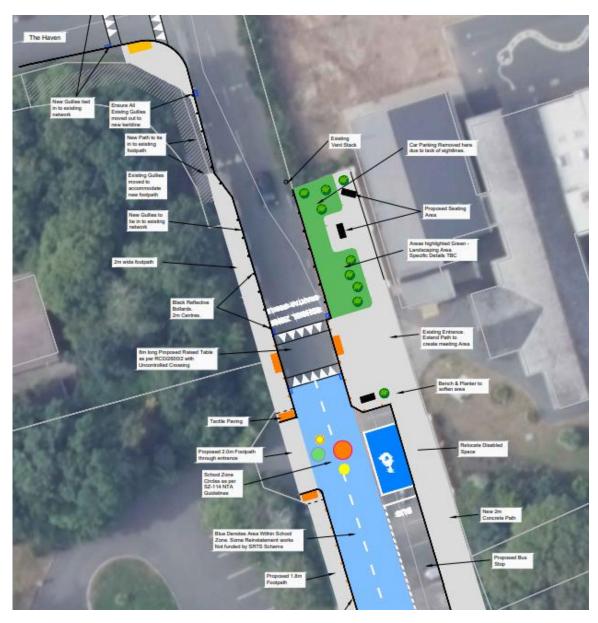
Example of design drawing for Scoil Mhuire Rosslare Safe Routes To School Scheme. Examples of SUD drainage areas, bollards, road marking, tactile paving, raised crossings and road tightening are shown.
